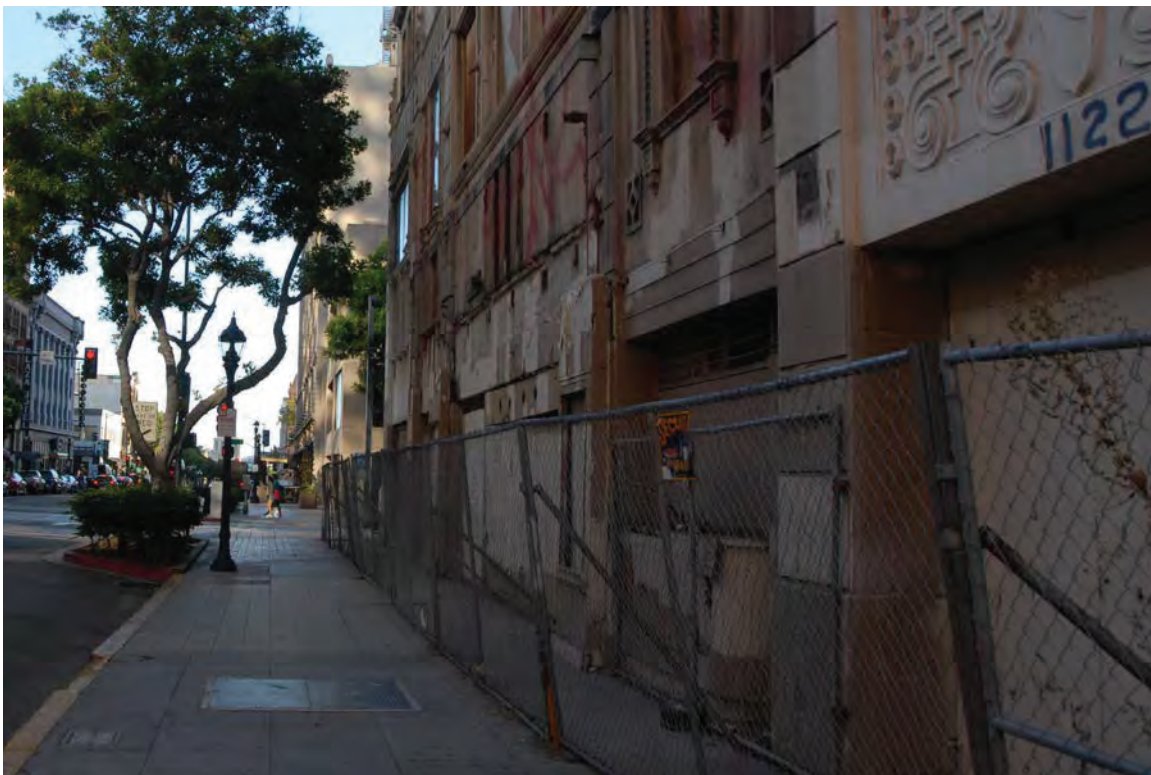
4th Avenue façade, location of former marquee. view facing southwest.
